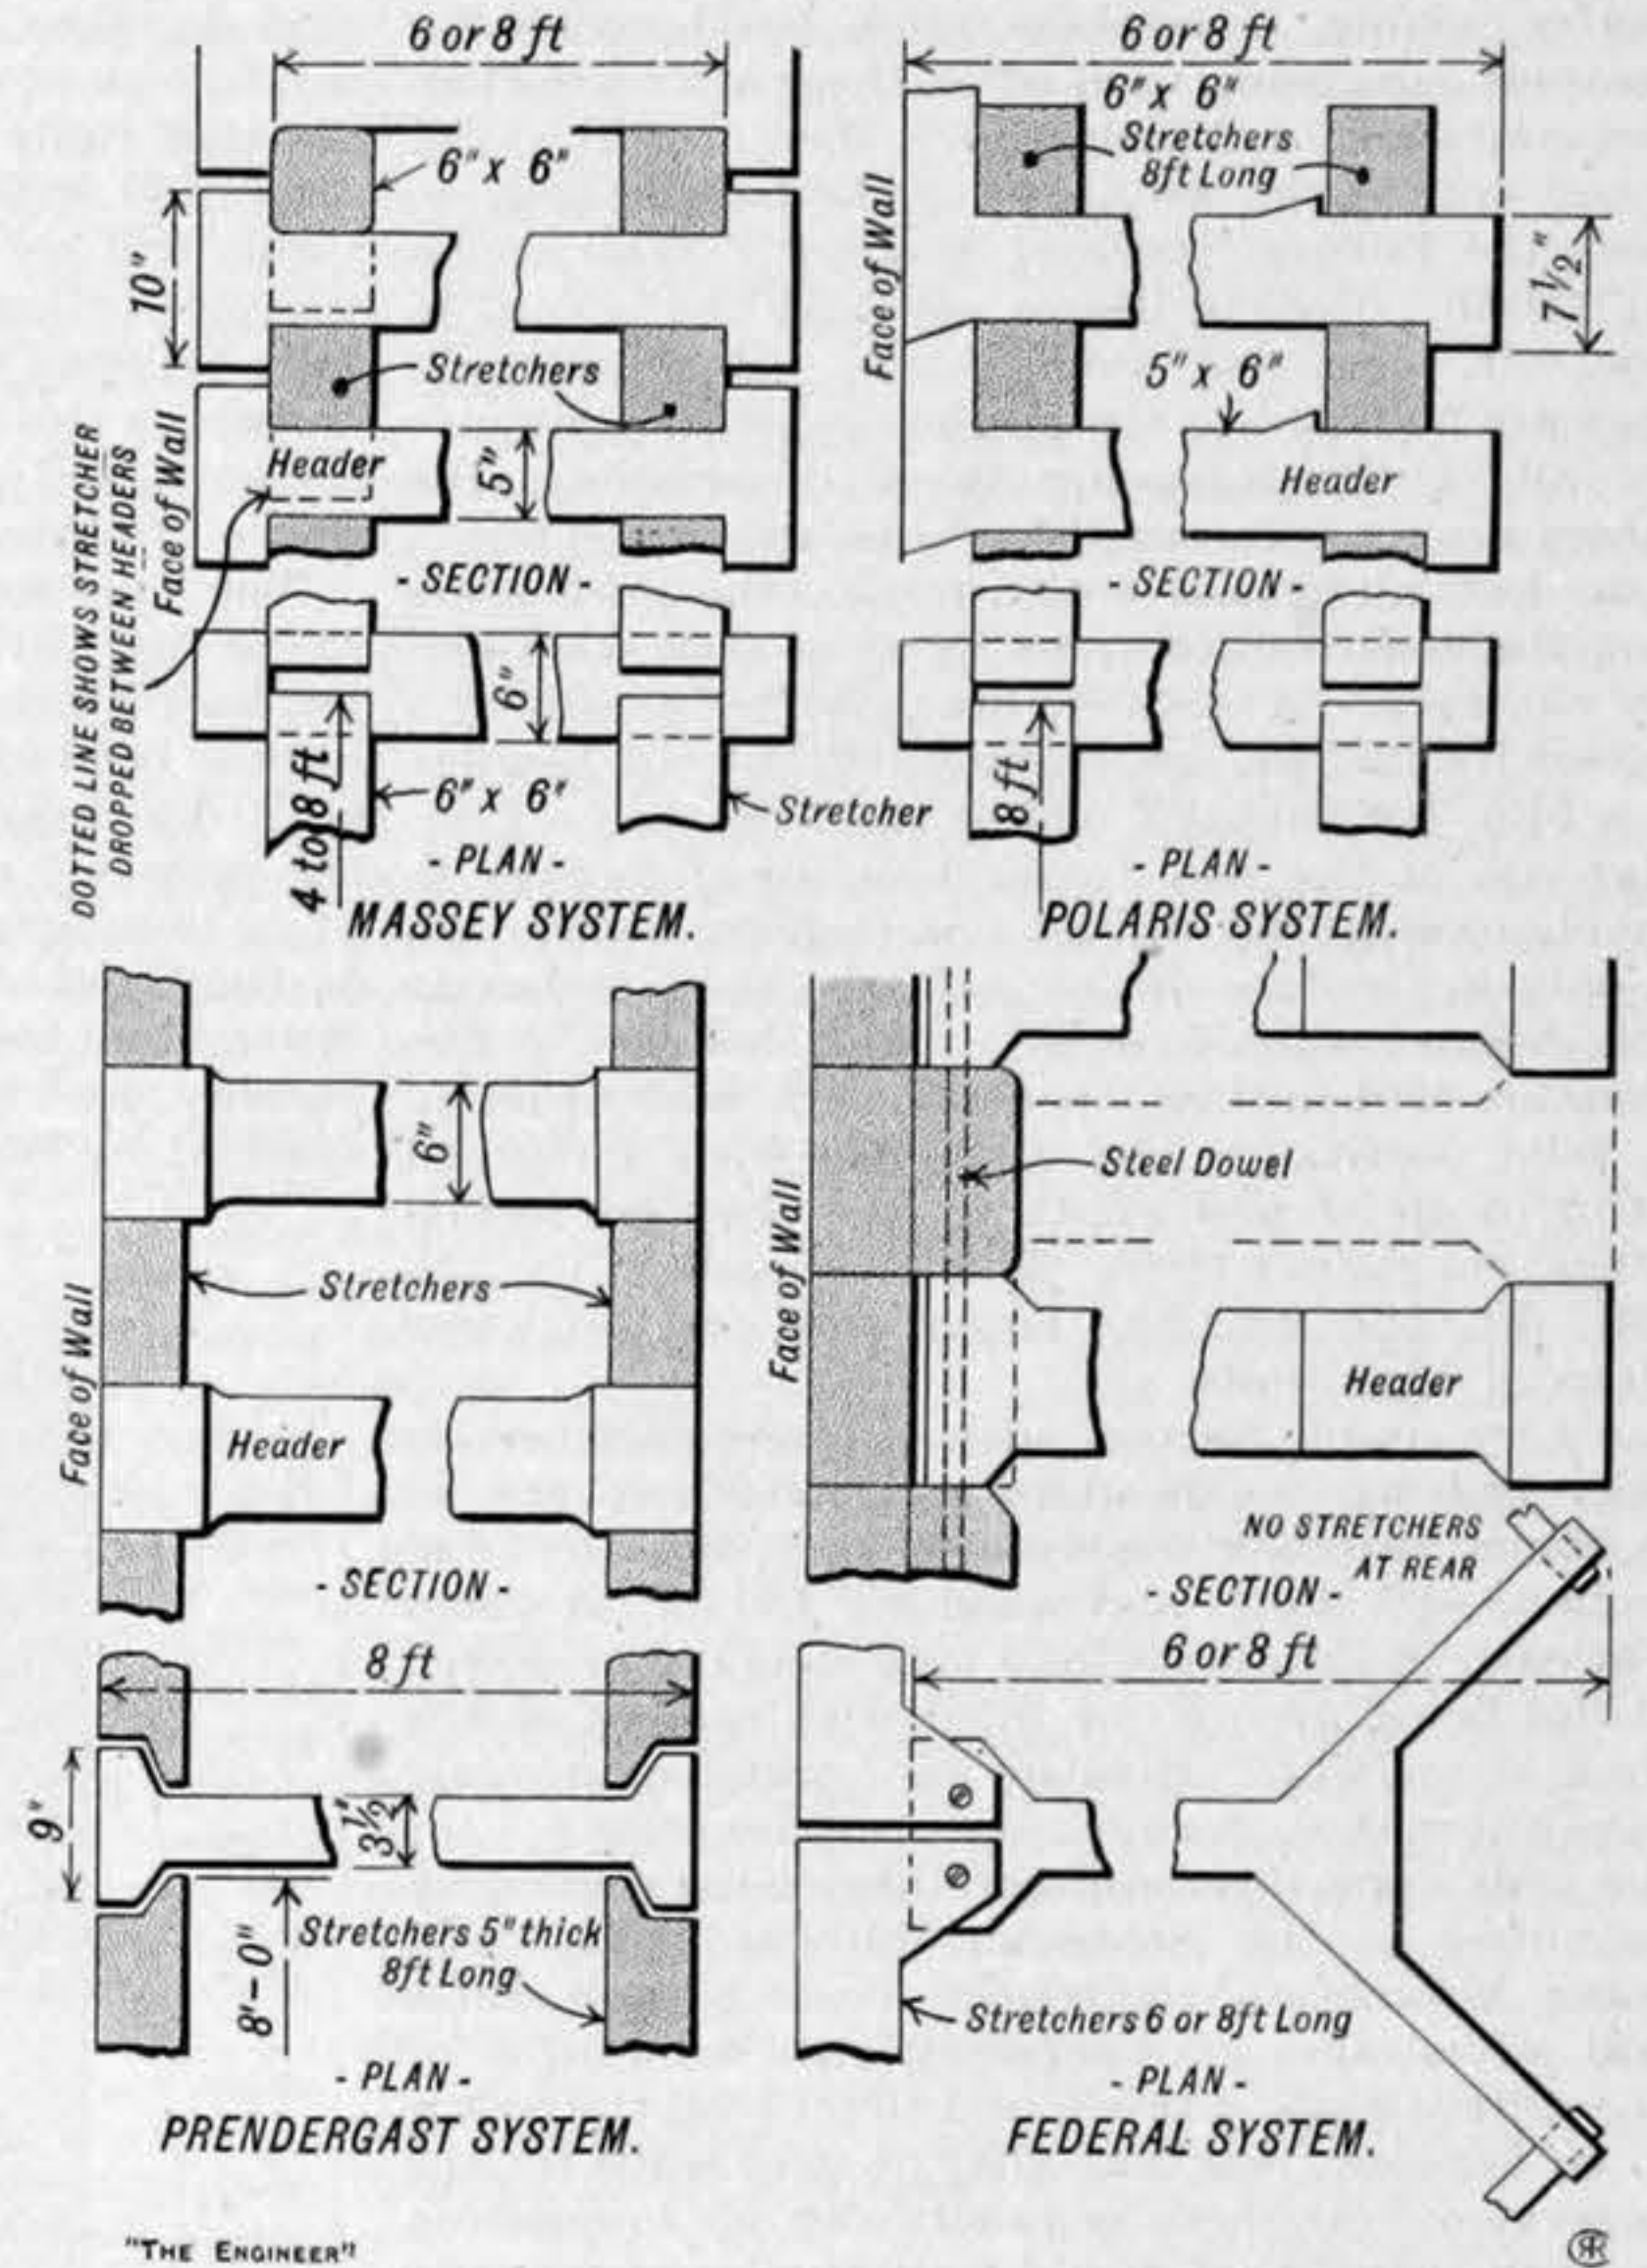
TYPES OF CRIB RETAINING WALL CONSTRUCTION
